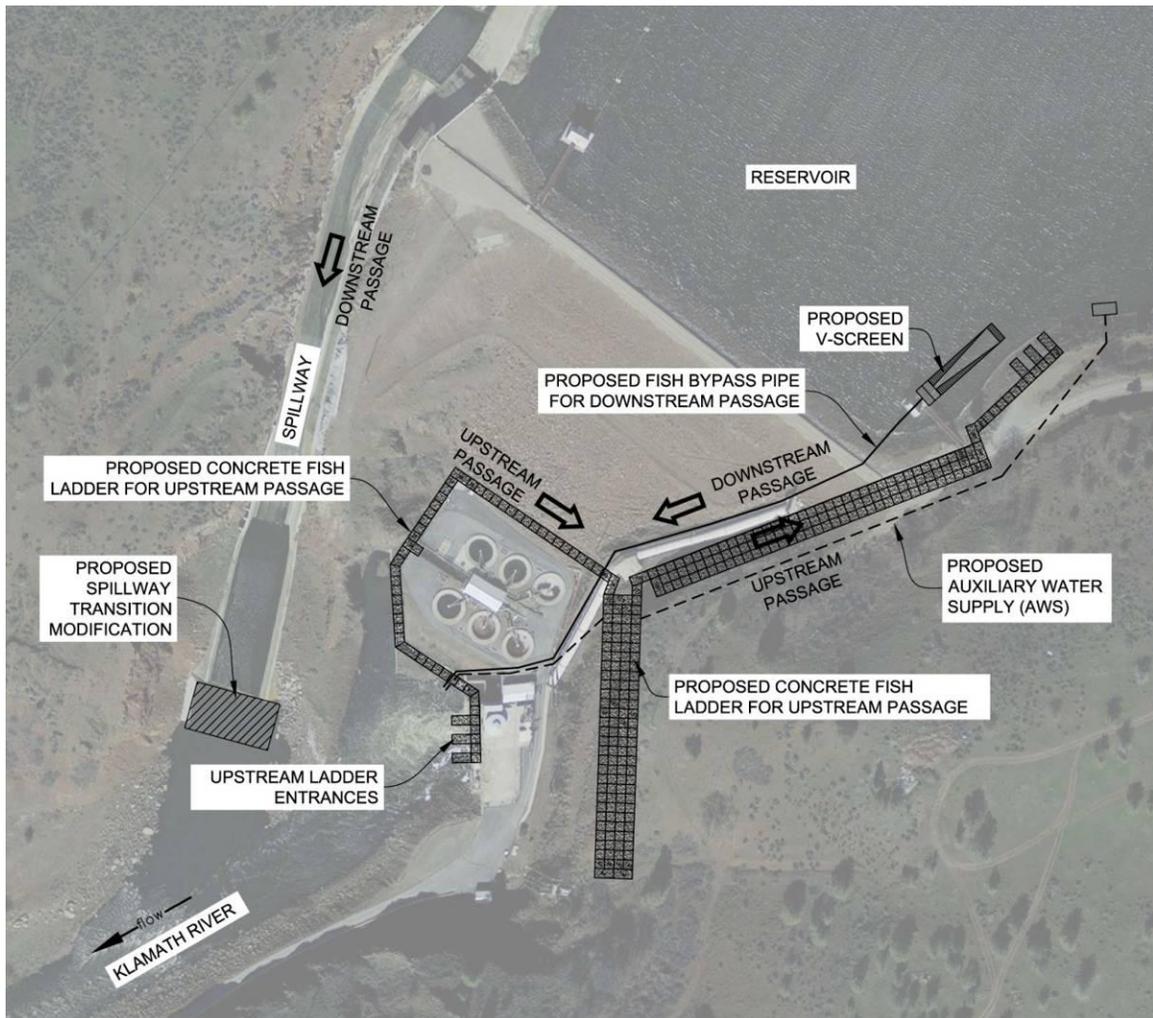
Conceptual Fish Passage Facilities Layout for Iron Gate Dam showing fish ladder, water intake screen, and spillway transition modifications
